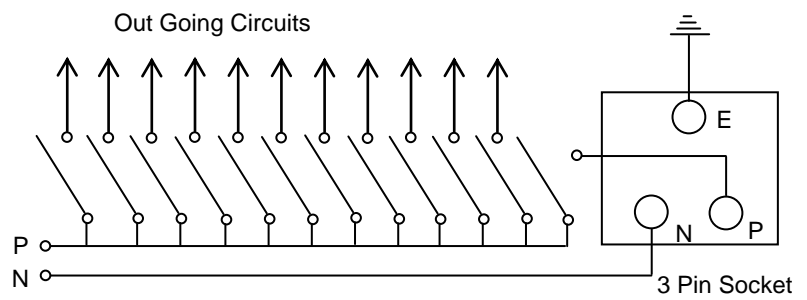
Testing of Polarity of Switches and Three Pin Socket
